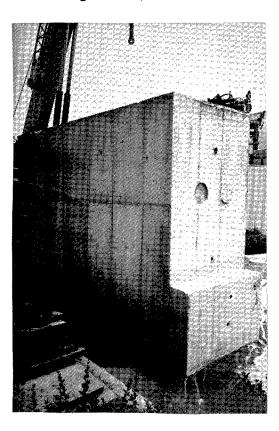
Concrete test structure built with features to complicate task of installing repair system underwater
